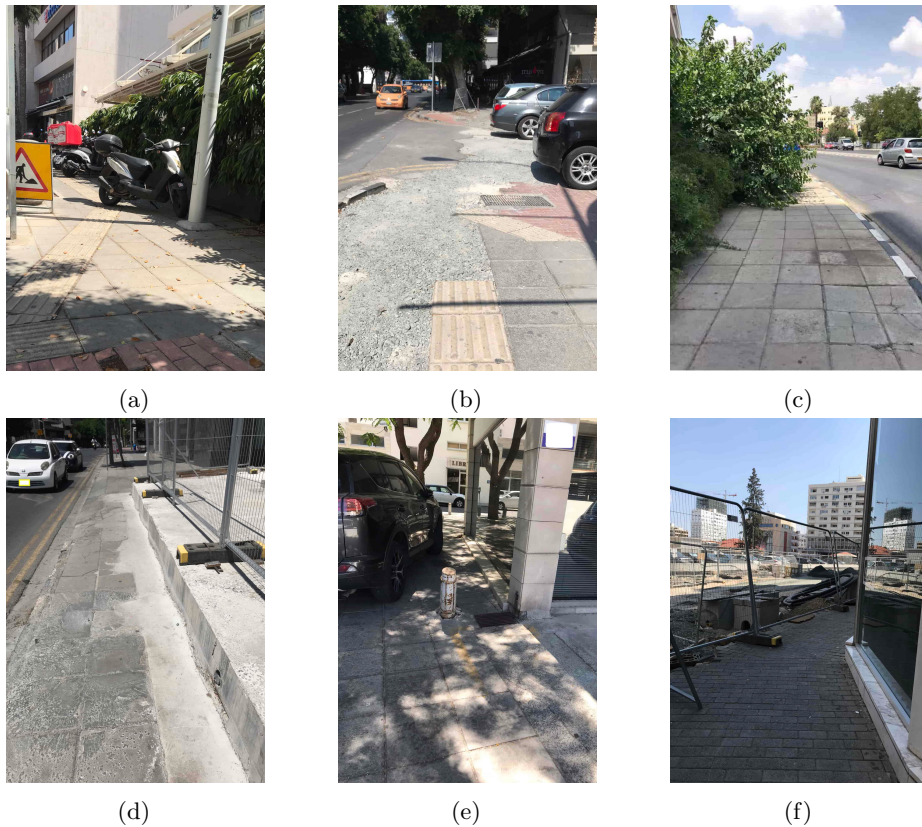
Examples of obstacles that impede pedestrian routes (a) Illegal parking; (b) Broken pavement; (c) Pavement blocked by bush; (d) Narrow pavement; (e) Illegal parking/Parking prevention barrier, and (f) Roadworks.
